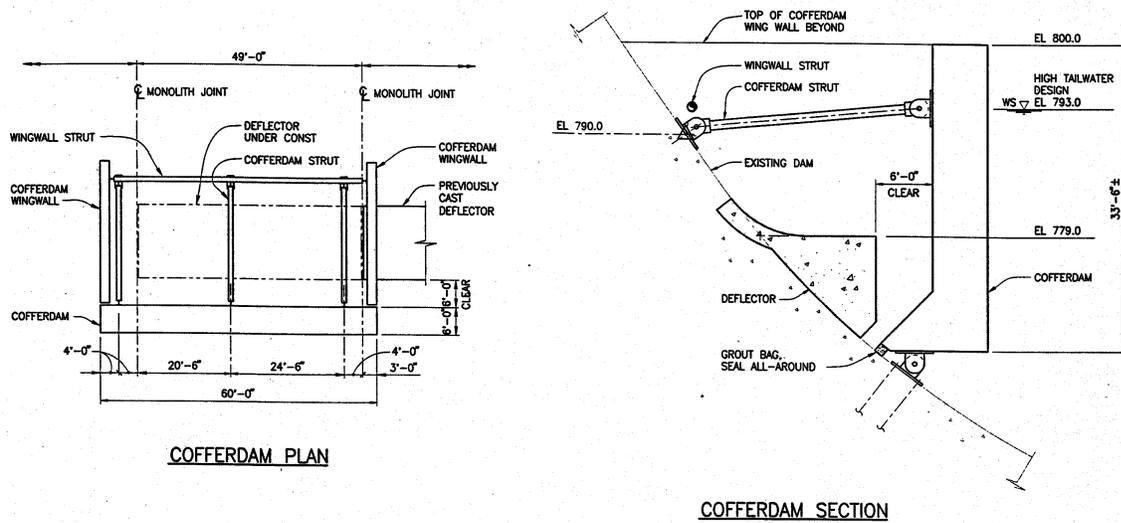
Plan (overhead) view and side view of floating cofferdam structure. Present plan is to seal the base and sides of the cofferdam to the dam face with grout bags after bolting base and struts in place and fixing sidewalls in, and then begin deflector construction.
